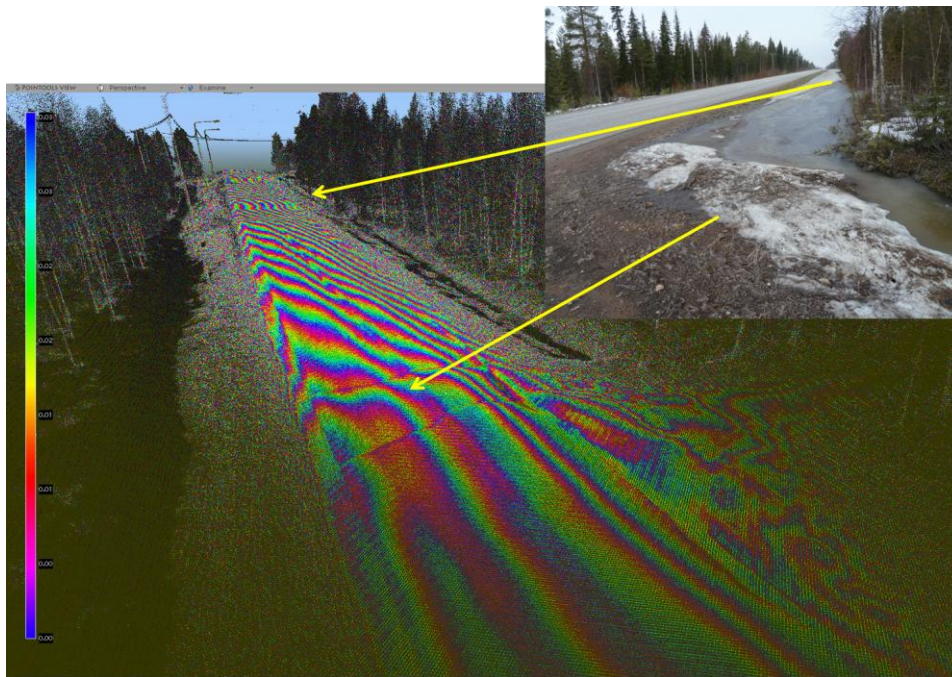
\_1. Example from road 934, section 2. The private road access is frozen and the culvert clogged with the result that water has flooded above it in the right ditch. The rainbow image shows the places where the problems appear on the road: 1) around the private road access and 2) at the end of the flooded "lake".
